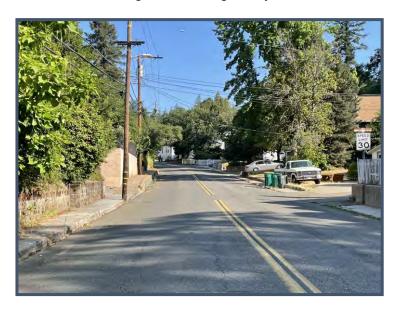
Canal Street looking northwest, view of elevated sidewalk and no gutter pans and utility poles encroach upon the already narrow sidewalk
